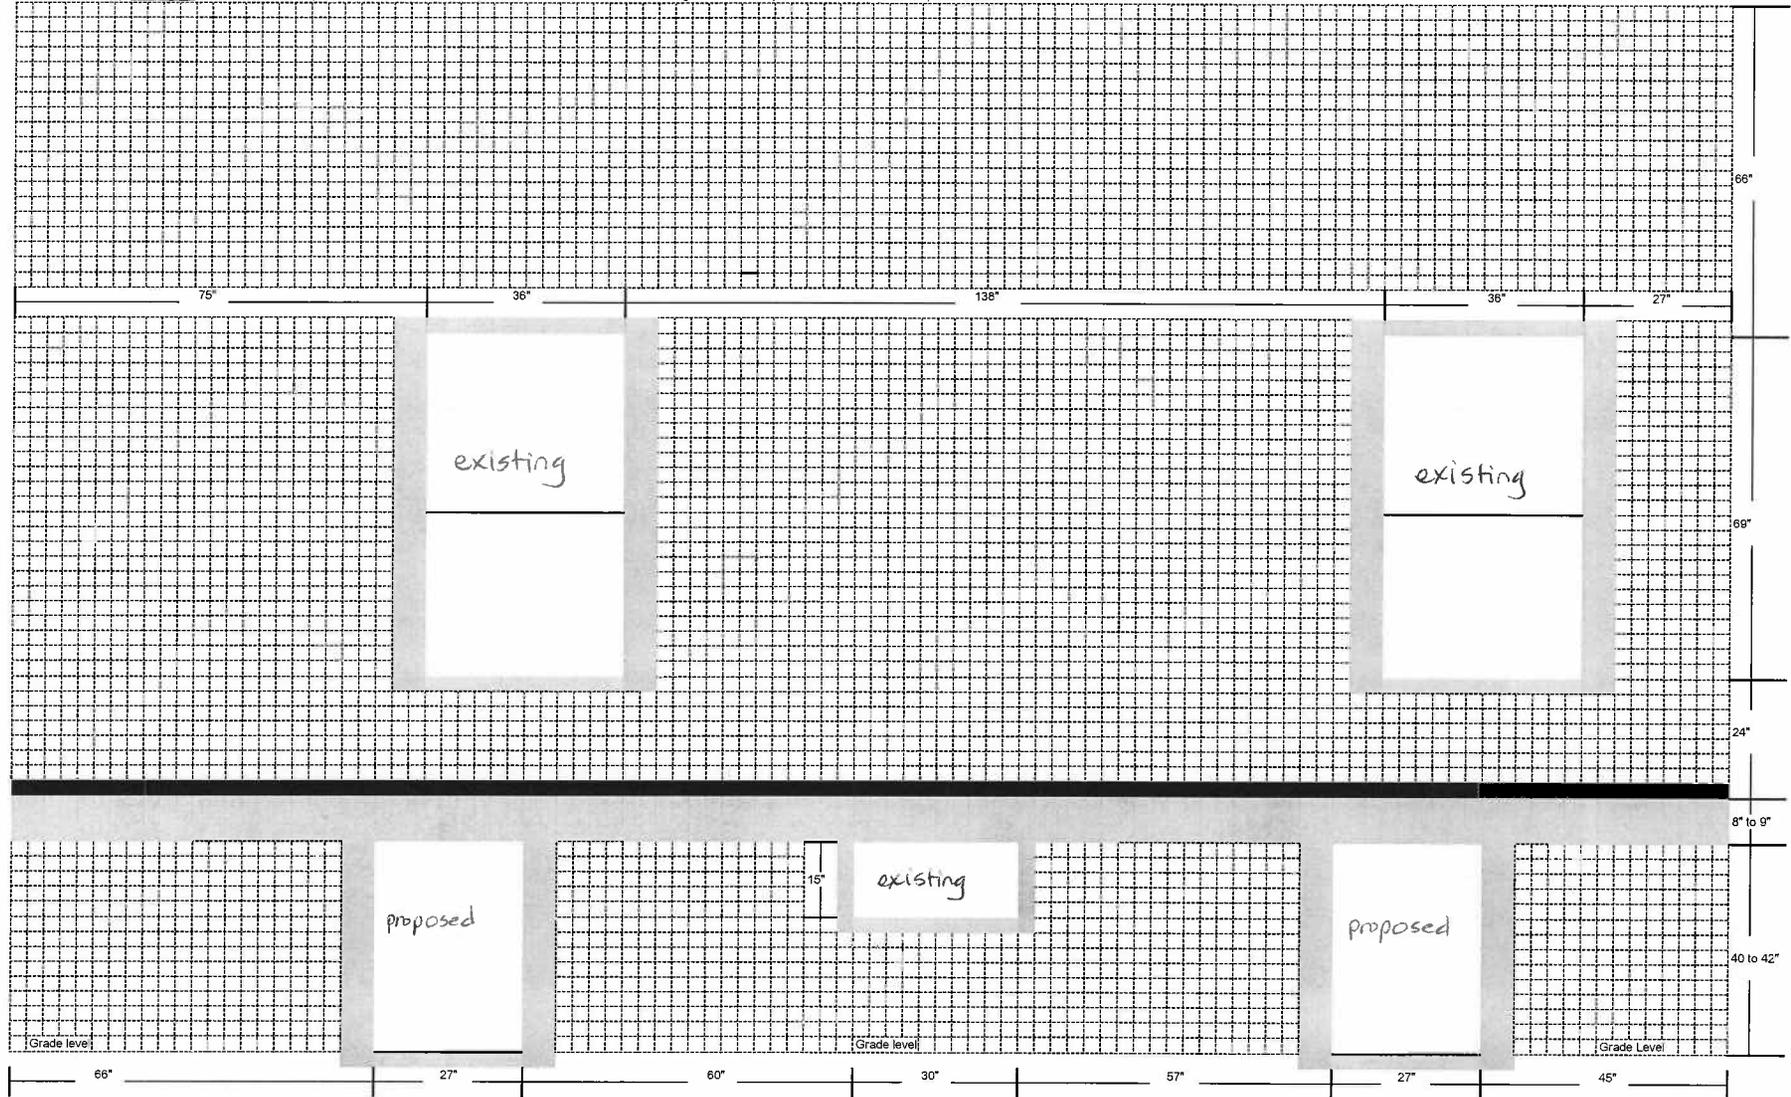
207 W. Jefferson East Elevation - 3 Metal Basement Windows
